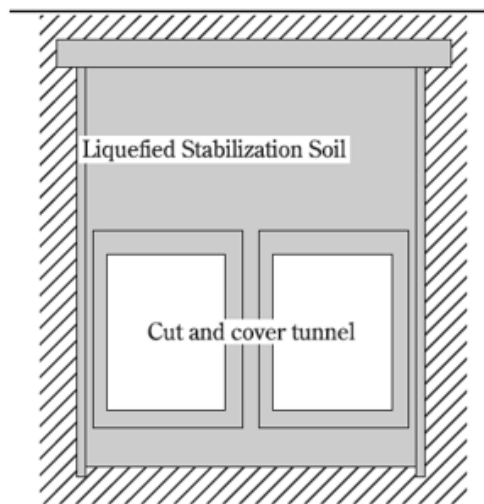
LSS used for backfill at the upper part of the cut and cover tunnel
